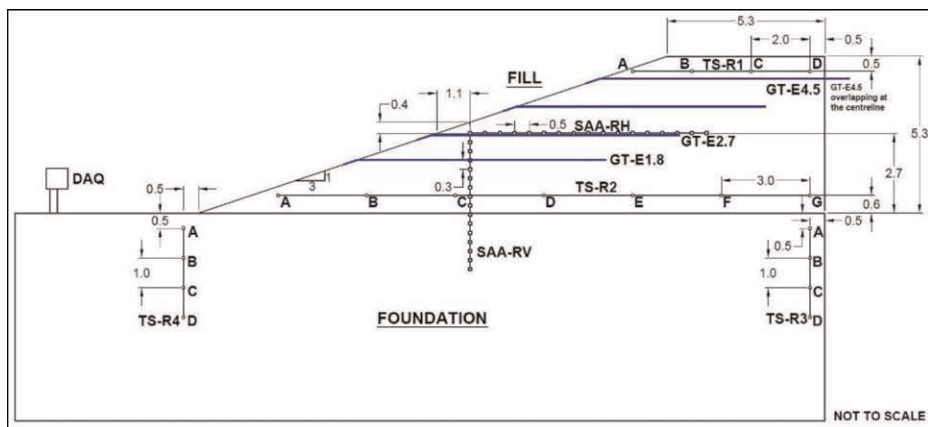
Instrumentation installed in the embankment cross-section with wicking geotextiles installed. Location of thermistor strings and ShapeAccelArrays (SAAs) in the test section. All units are in metres.
